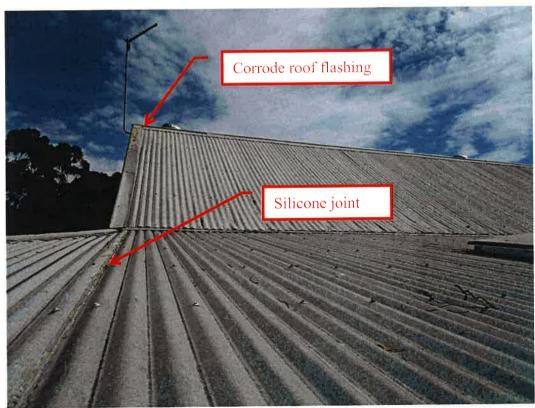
; North side roof. Silicane joint. Corroded roof flashing.
